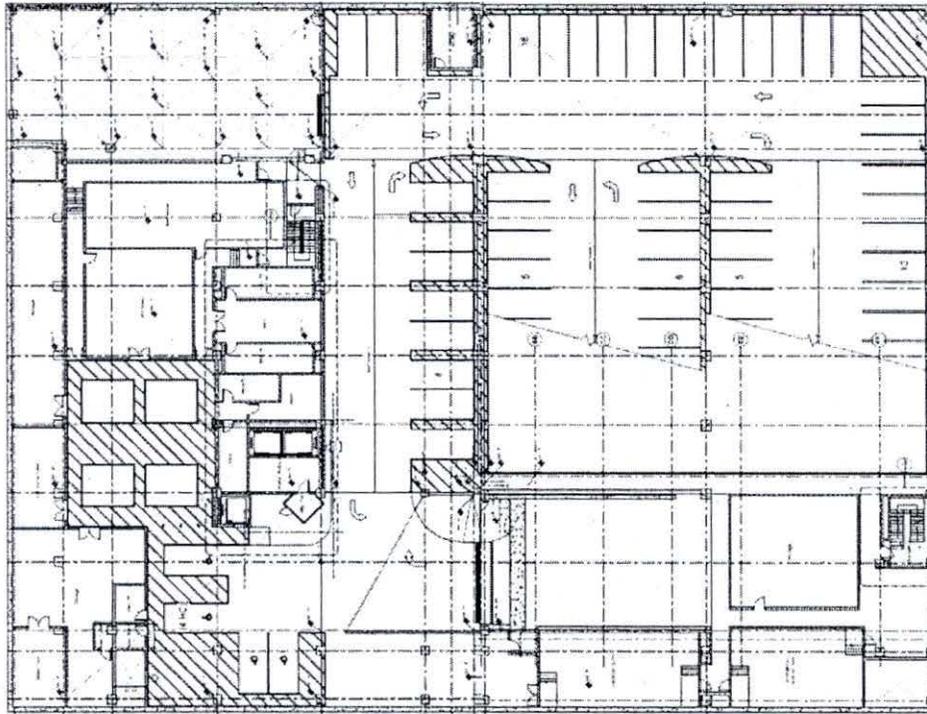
Parking Plans for MITRE 4 Building (Surface Lot)
